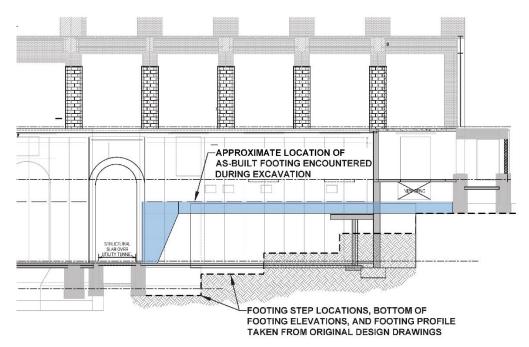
Section 4 Structural Plan (image adapted by authors; original courtesy of Gehry Partners, LLP and Magnusson Klemencic Associates)
